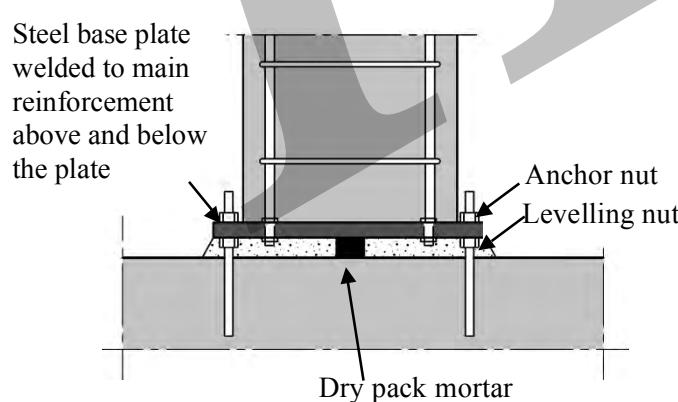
Base plate with starter bars welded to plate
